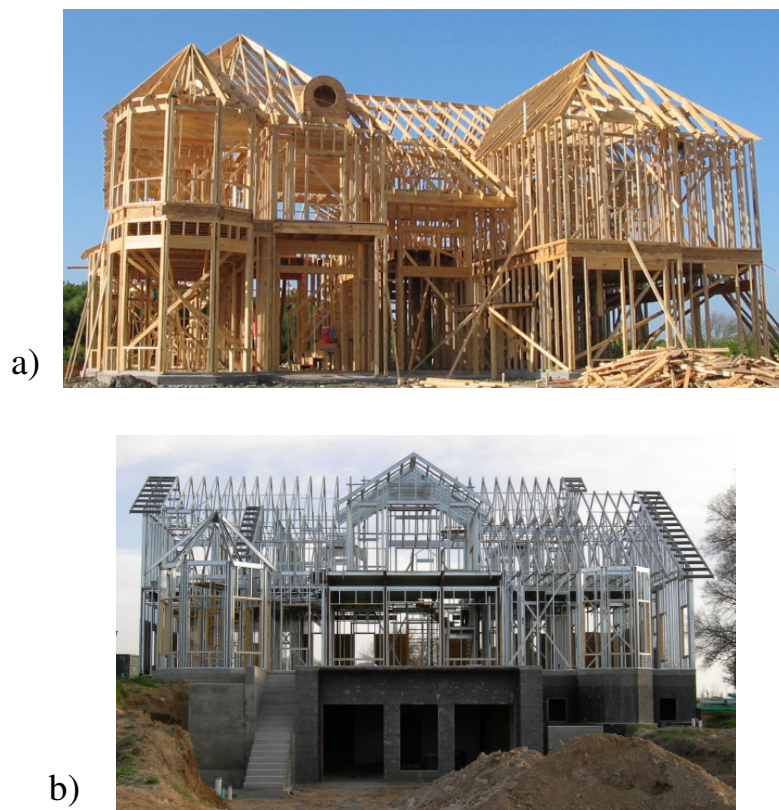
General construction of wood (a) and CFS (b) buildings (Steel Framing Alliance@, 2009)
